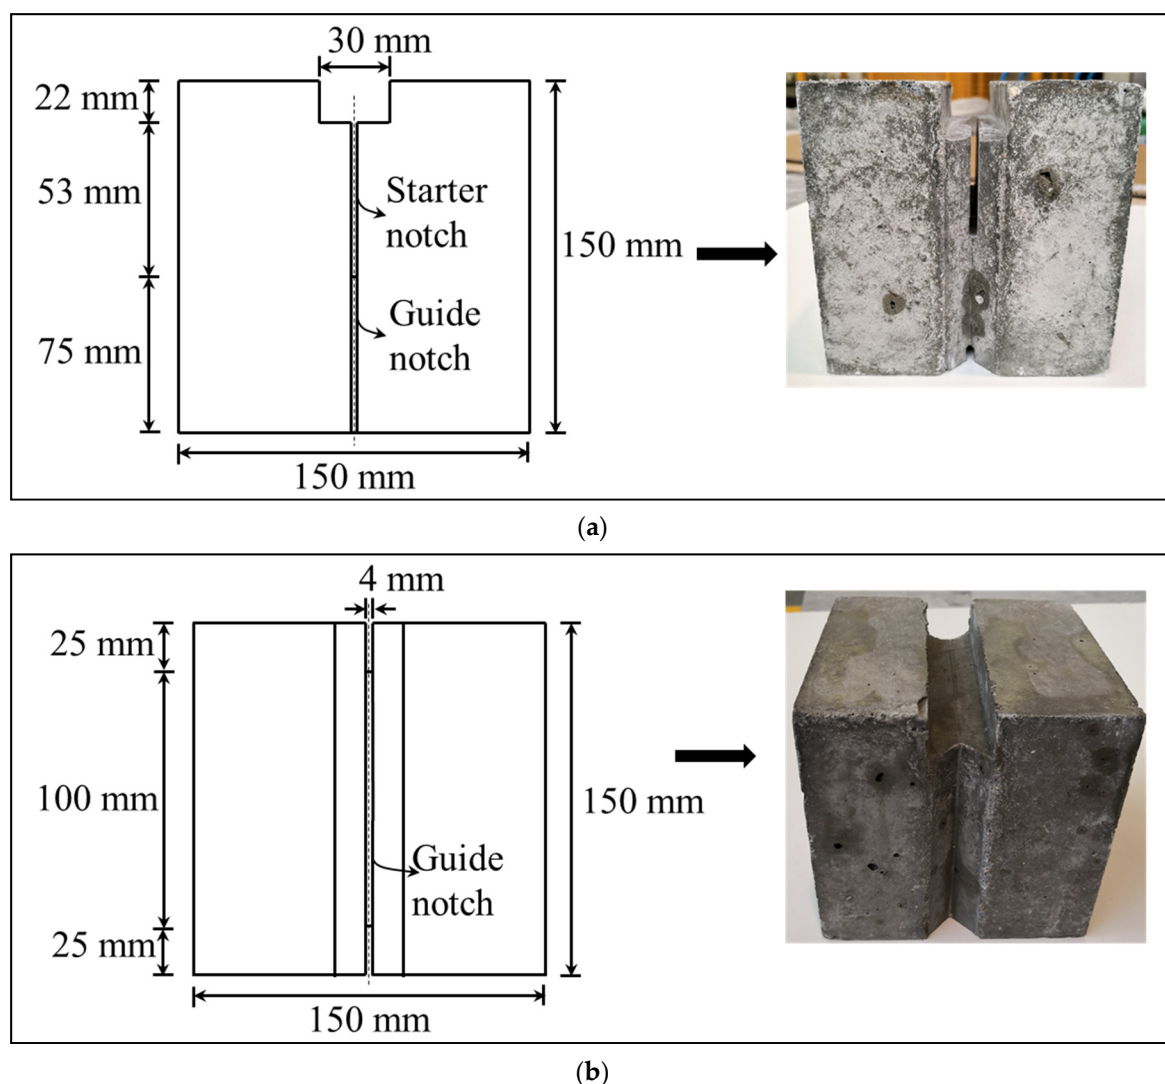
Illustration of the specimens' geometry: front view (a); top view (b).
